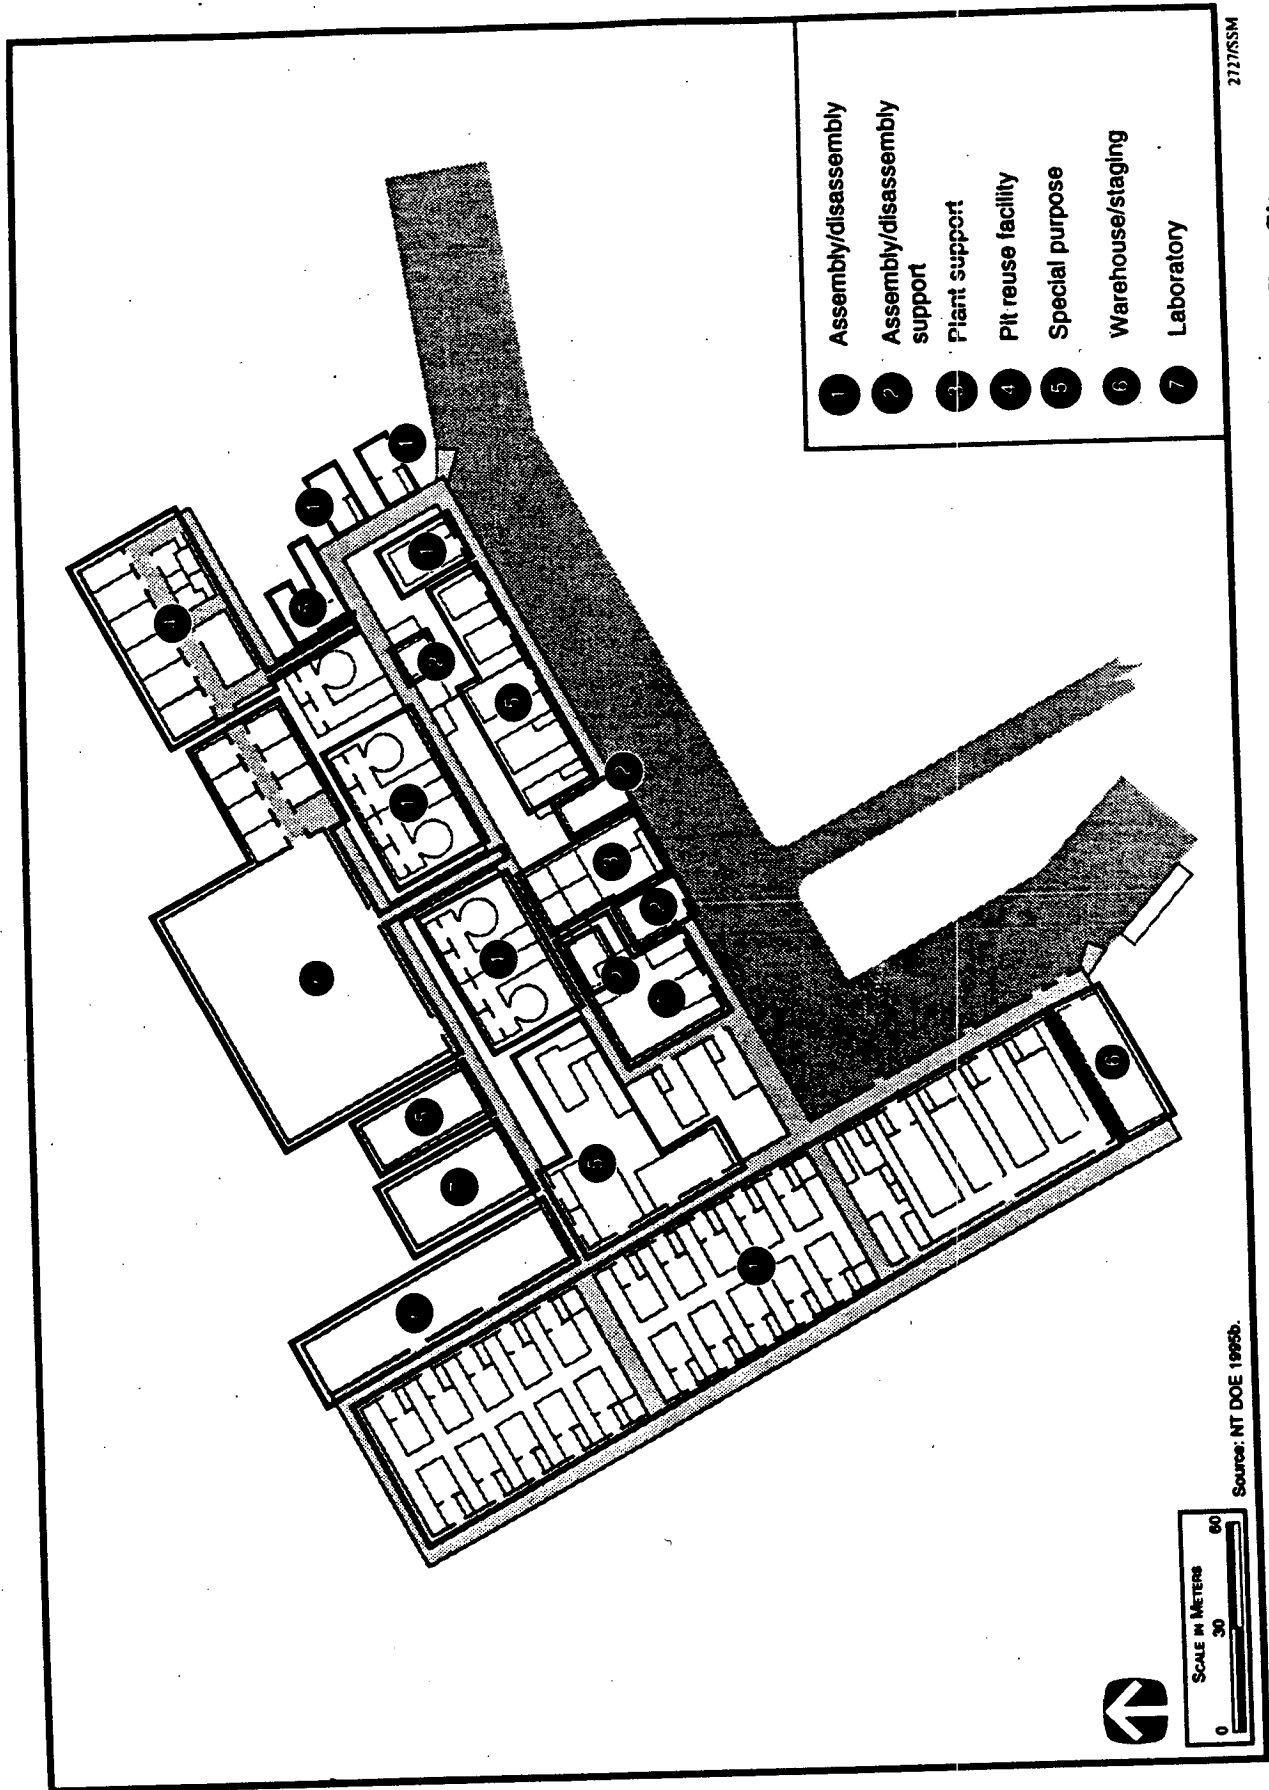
Weapons Assembly/Disassembly Site Plan (Expanded View) for Nevada Test Site.
